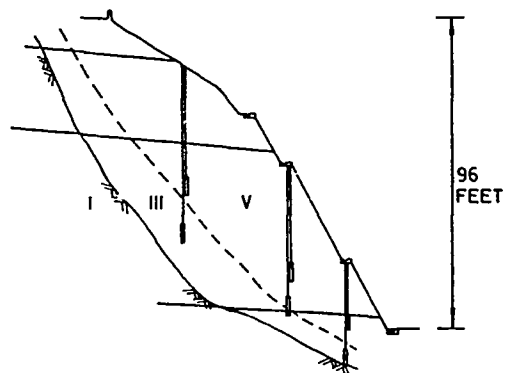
Lower Slope Section Showing Horizontal Drains and Piezometers
